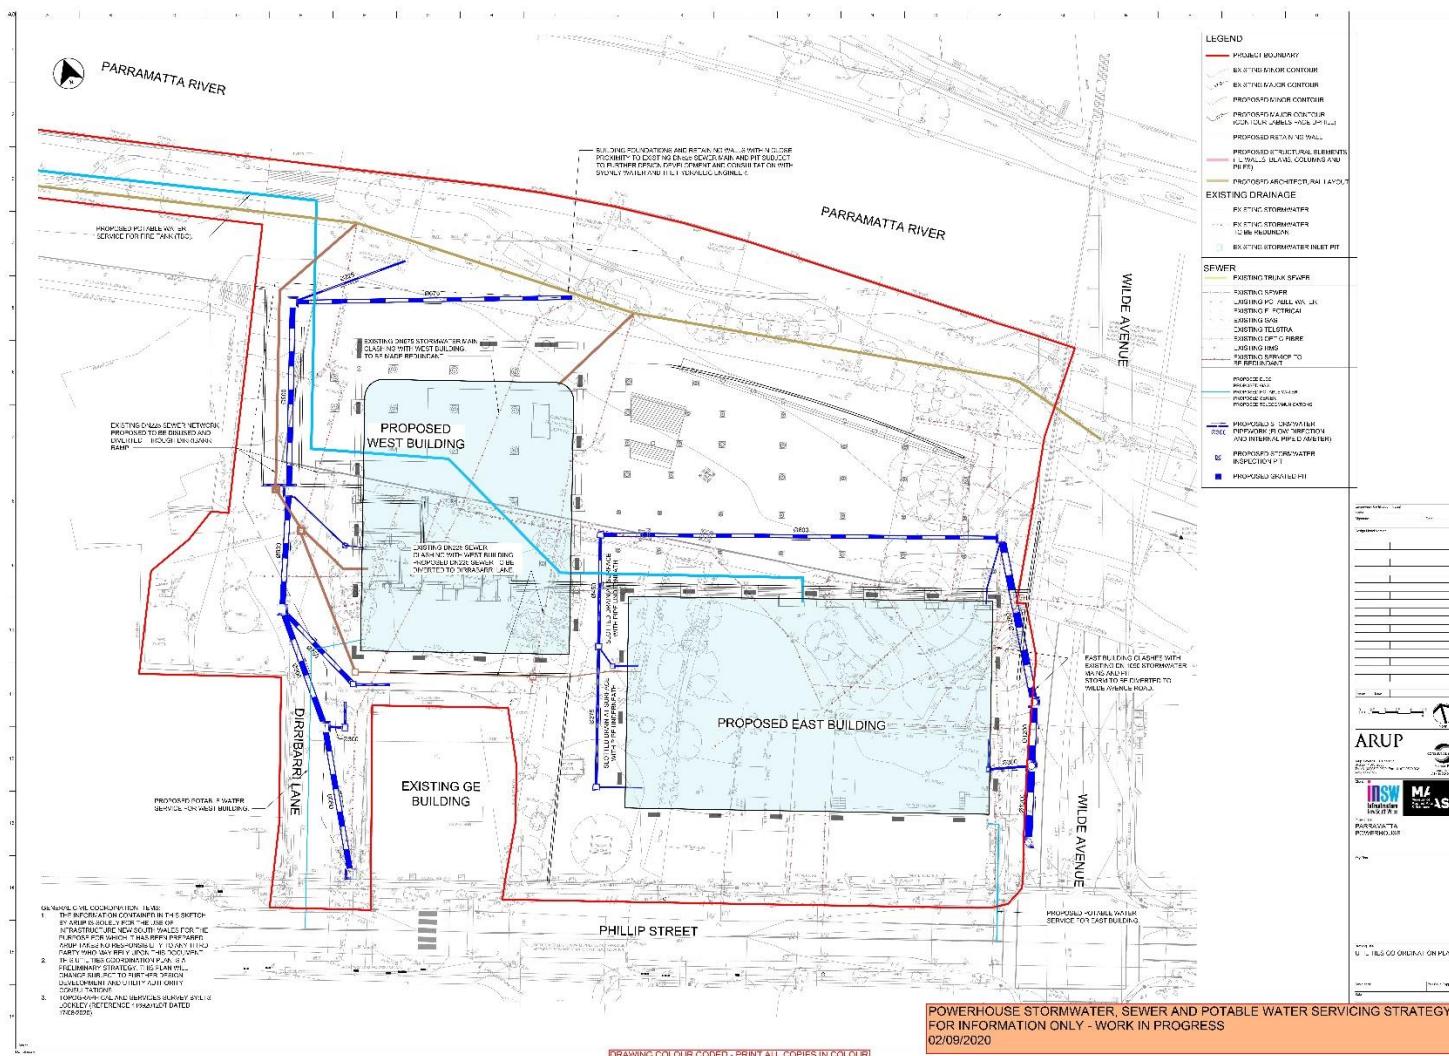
Plan of stormwater, sewer and potable water supply at the study area. (Source: ARUP)
